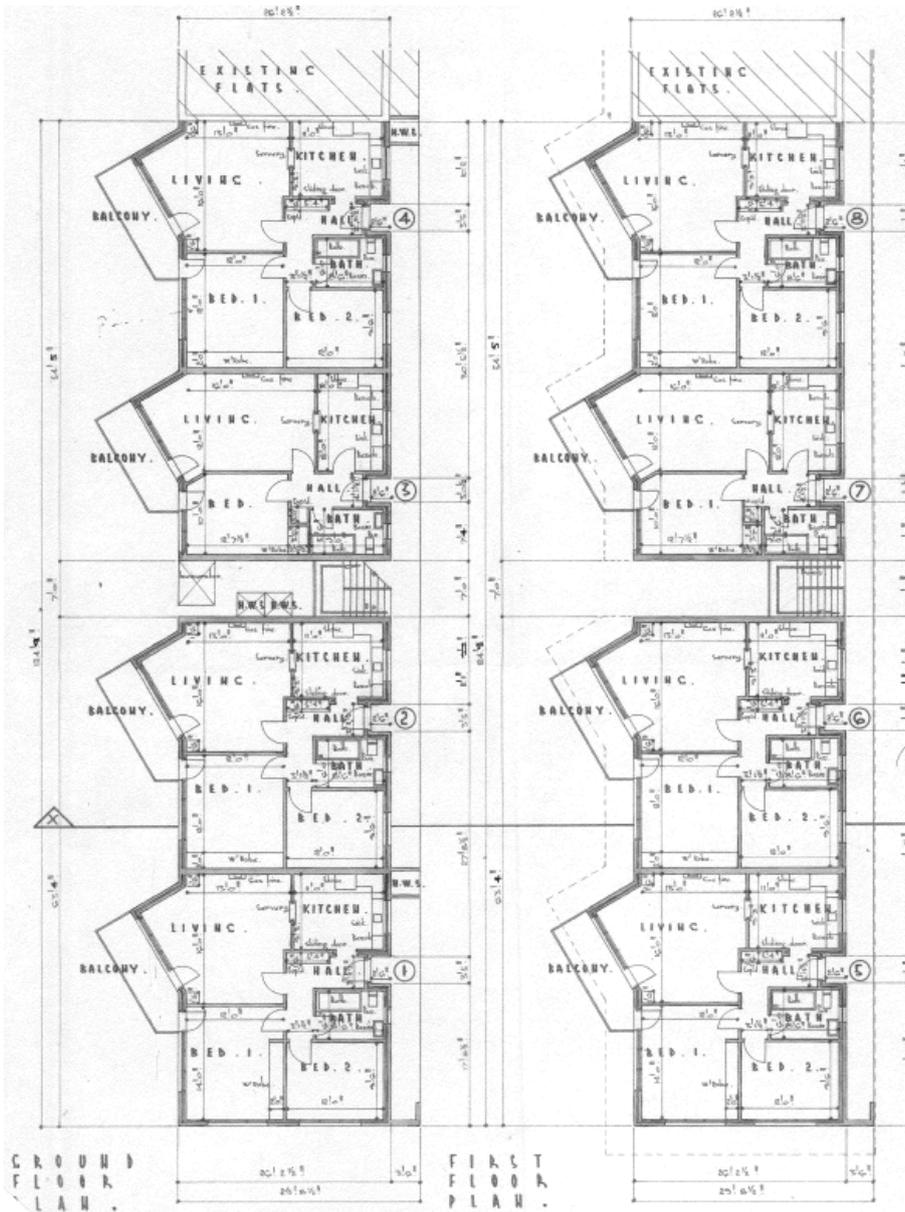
Undated drawings (elevations and plans) relating to building permit 57/131 issued February 1958. (Source: Council Building File)
